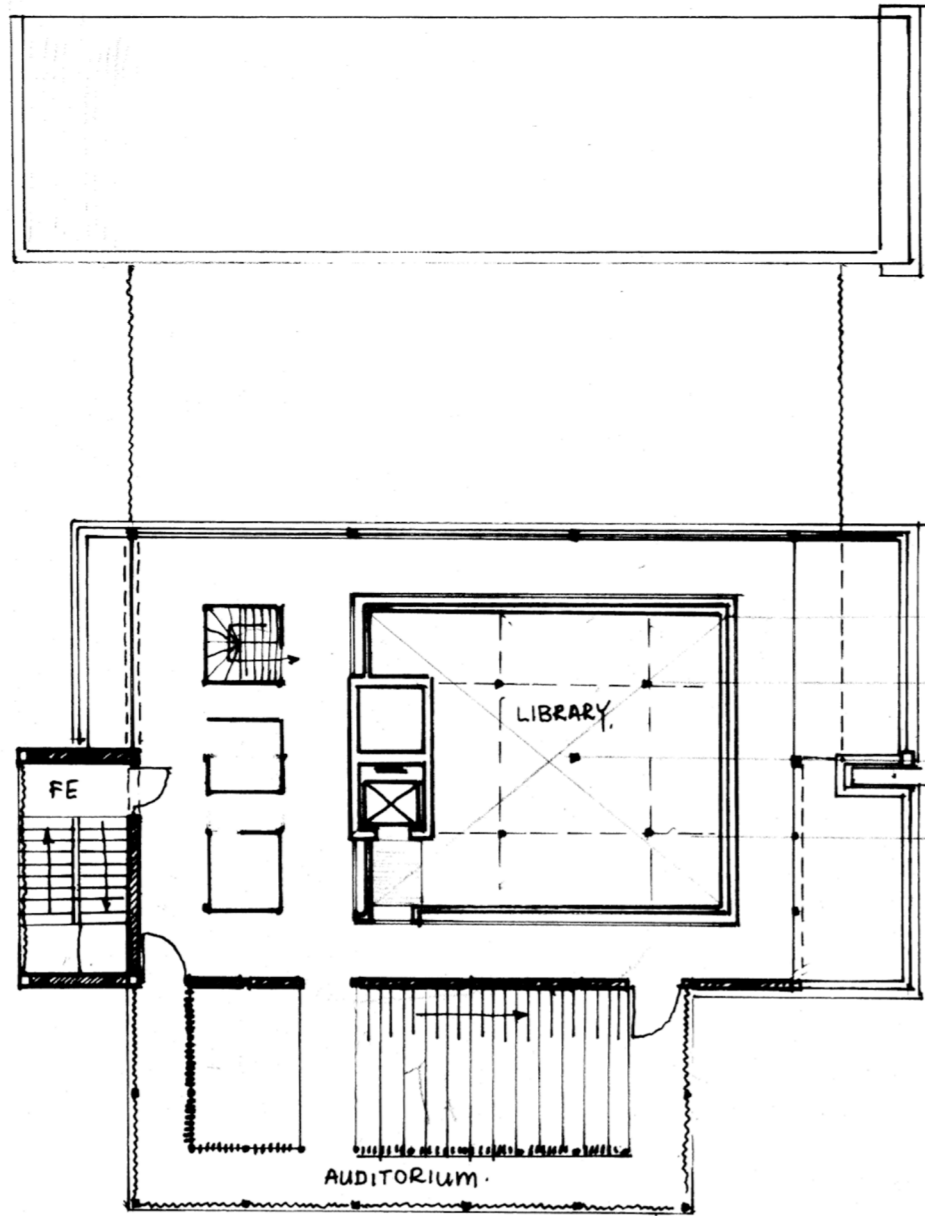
Development 8 Third Floor Plan (Author, 2021).
